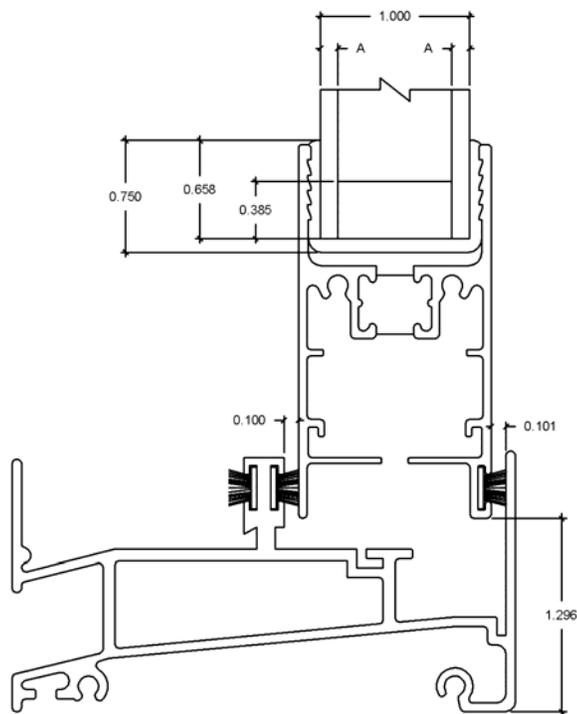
Dimensioned drawing for the sill vent cross section.
